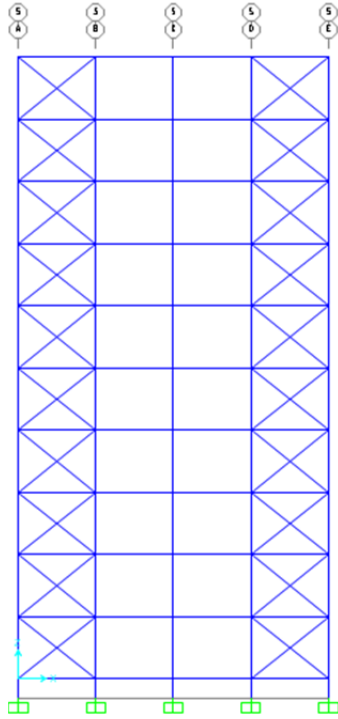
Elevation of Frame in Z direction(vertical) for steel frame with X- Bracing
